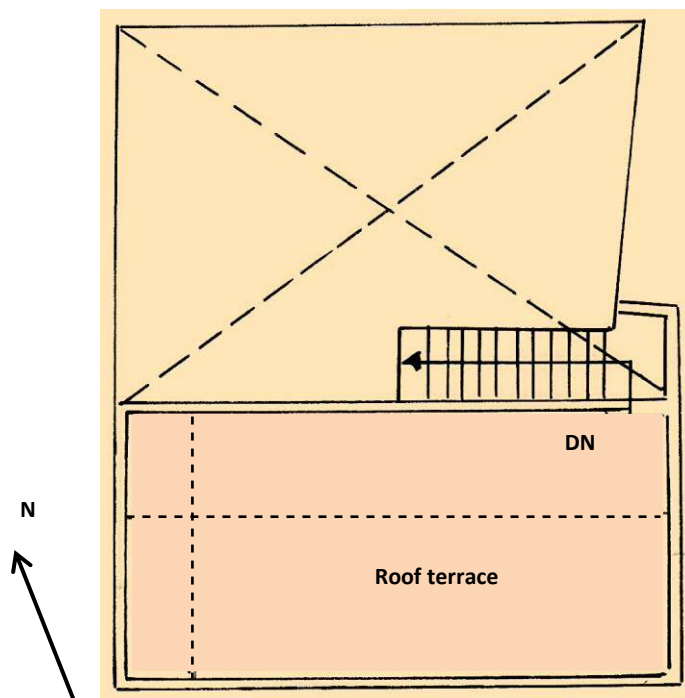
Roof terrace level plan of the modern house No. 4. Scale: 1:100
